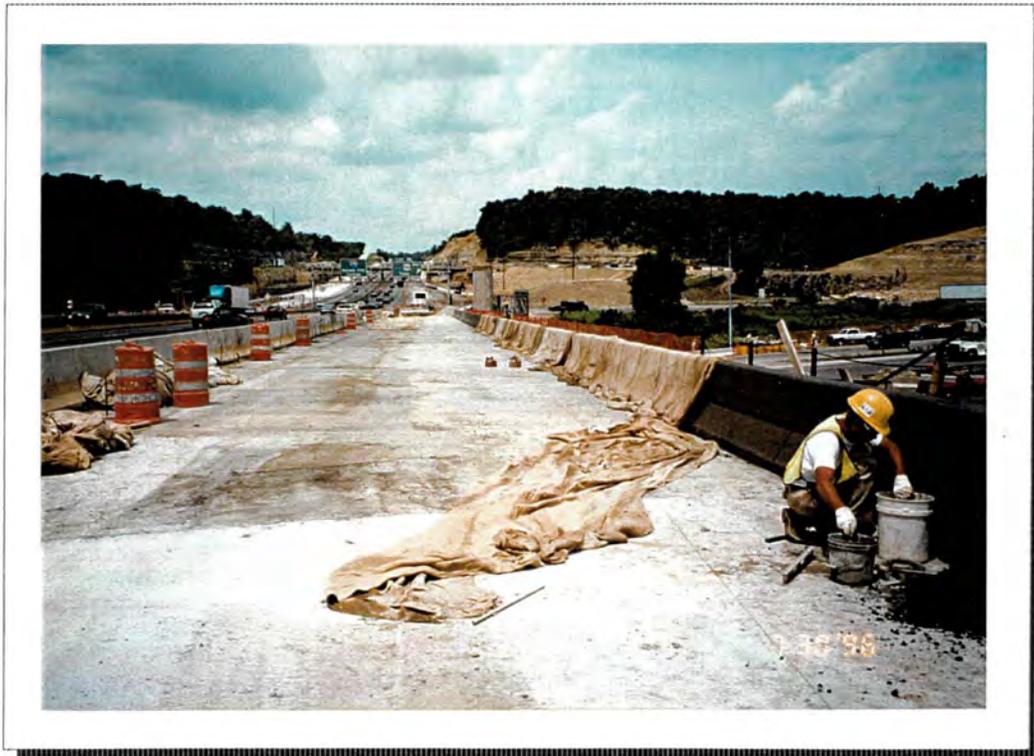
Burlap being placed on section at opposite end of section cured with RX Cure.
